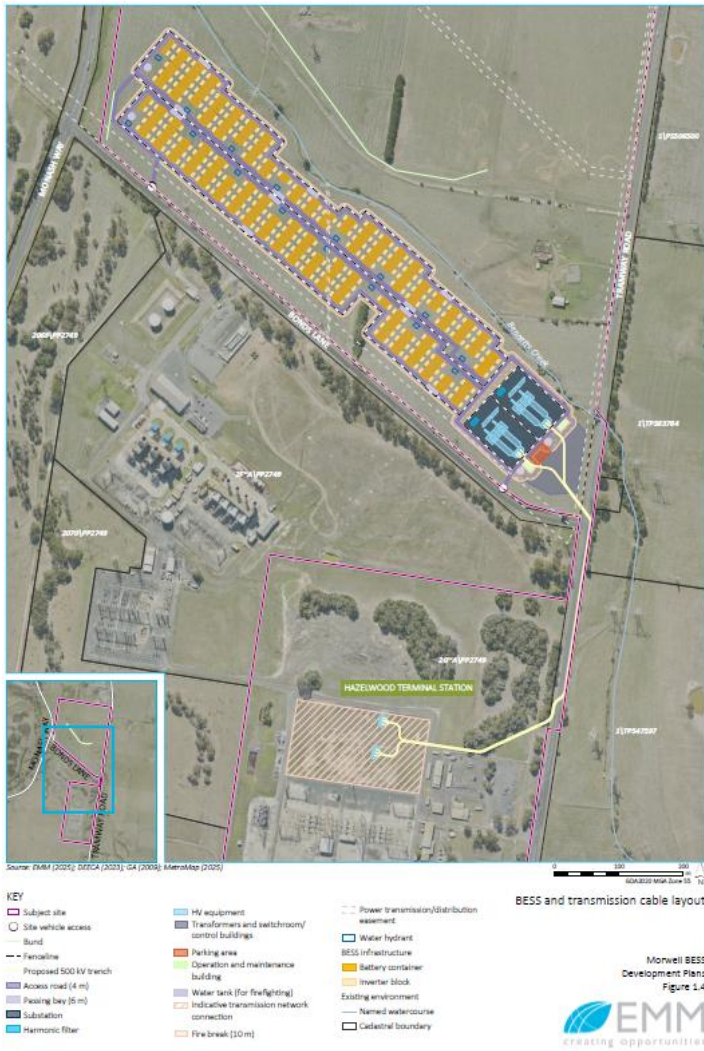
Proposed Morwell BESS indicative site layout. Source: Advertised documents.
